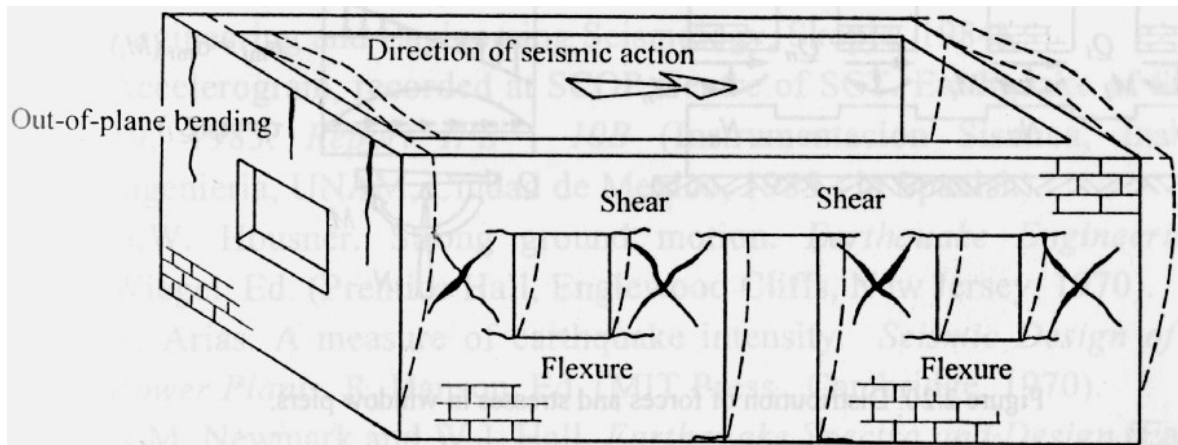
Typical deformation and damage to URM building (Courtesy of [To 99])
